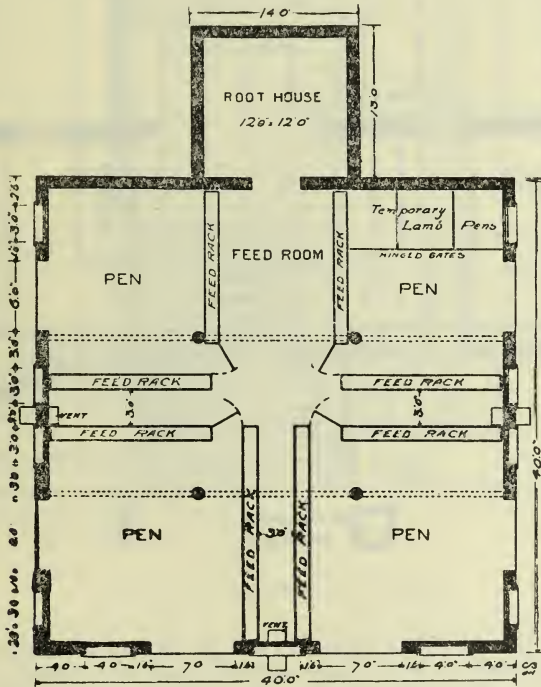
Sheep Barn, Ground Floor Plan.
